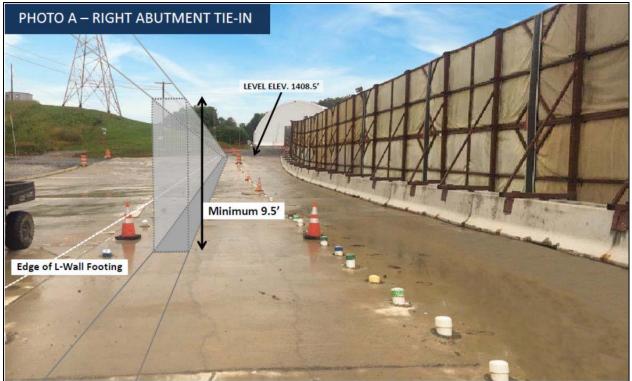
Photo illustration of the existing construction wall (right) and the proposed floodwall height (left).
